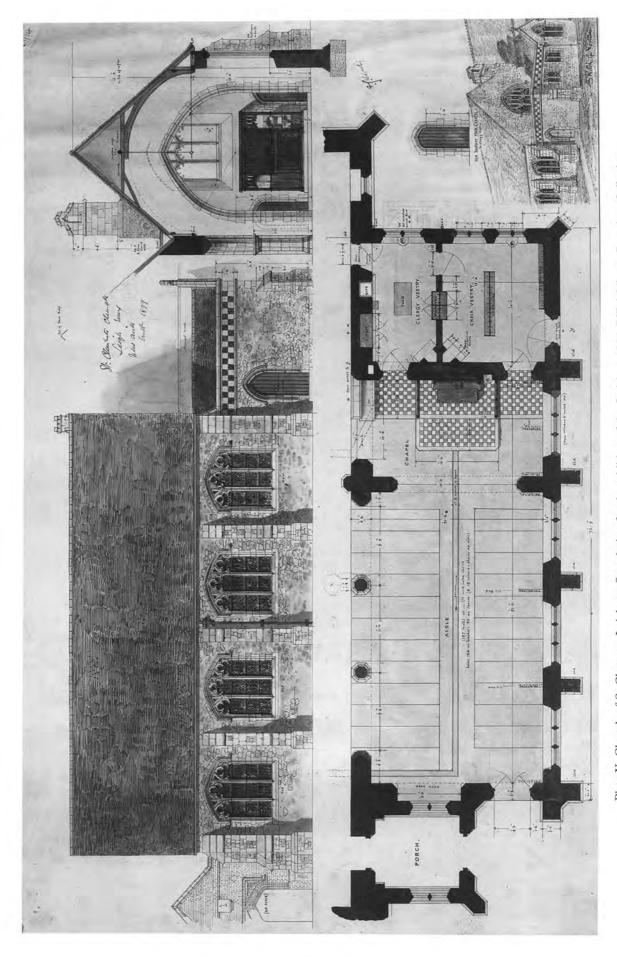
Plate X Church of St Clement, Leigh-on-Sea: design for the addition of the S aisle, c.1898 RIBA Library Drawings Collection
